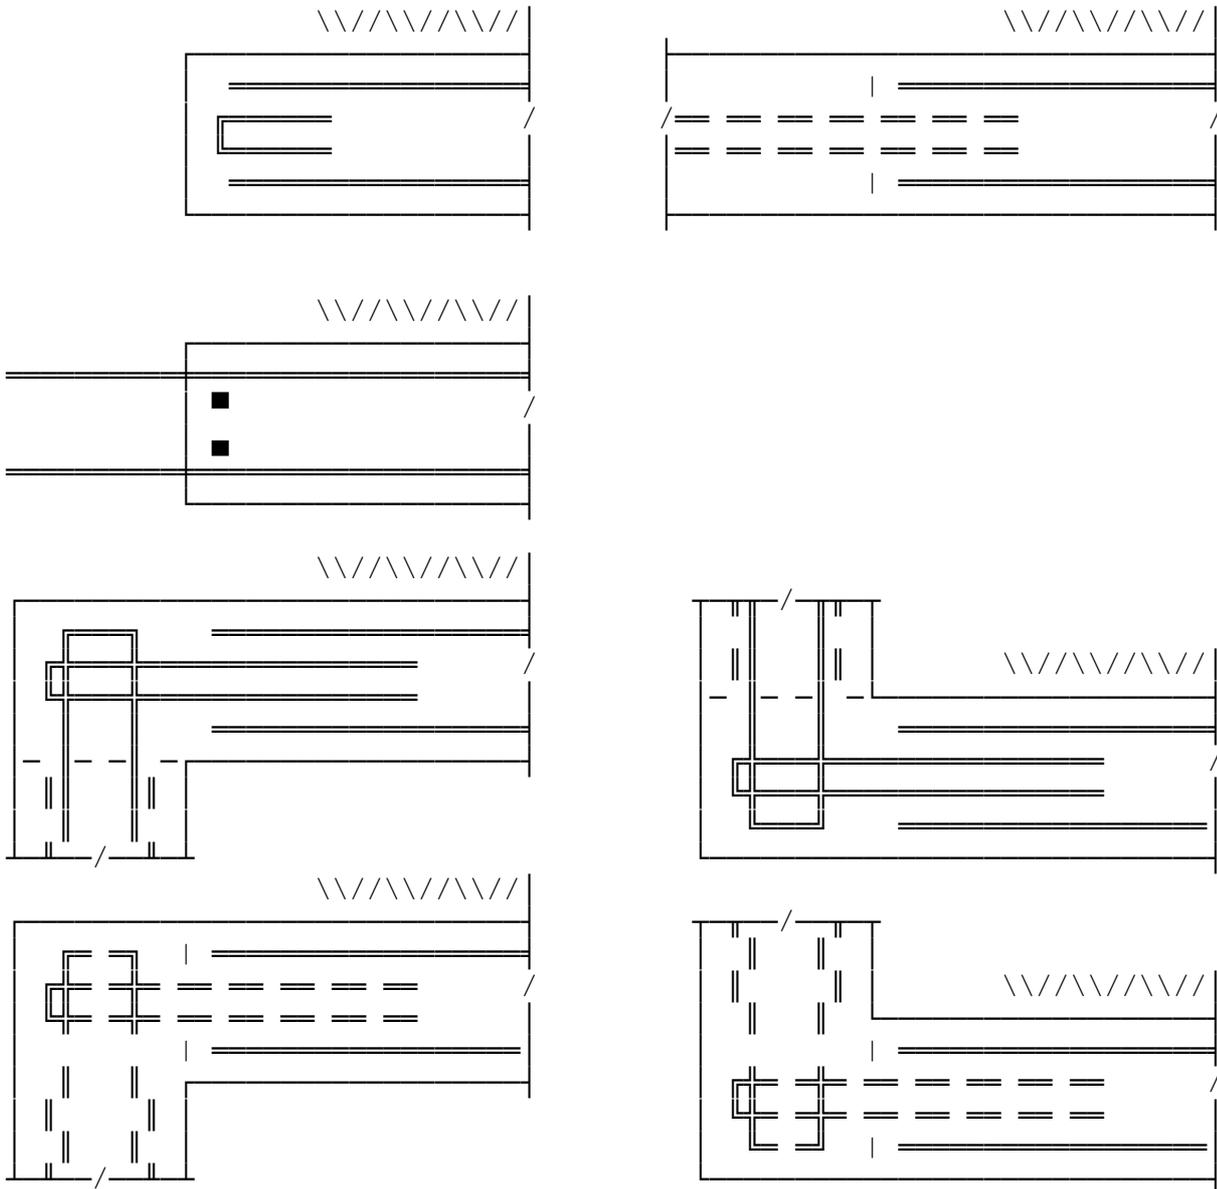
SUMMARY OF PLAN DETAILS FOR LEFT HAND END
